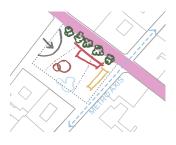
FLOORPLAN PLAZA SANTA CLARA
